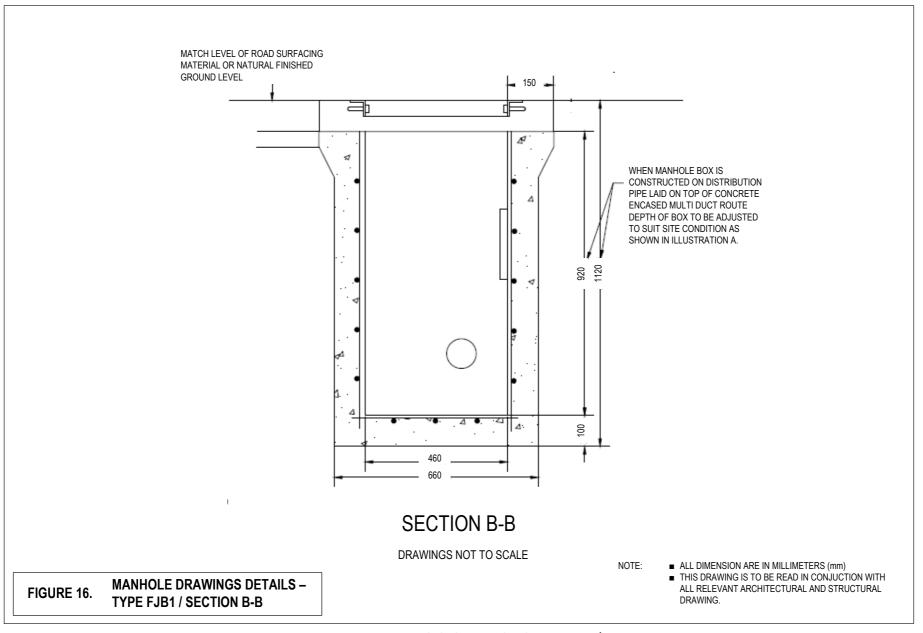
Manhole drawings details – Type FJB1 / section B-B
